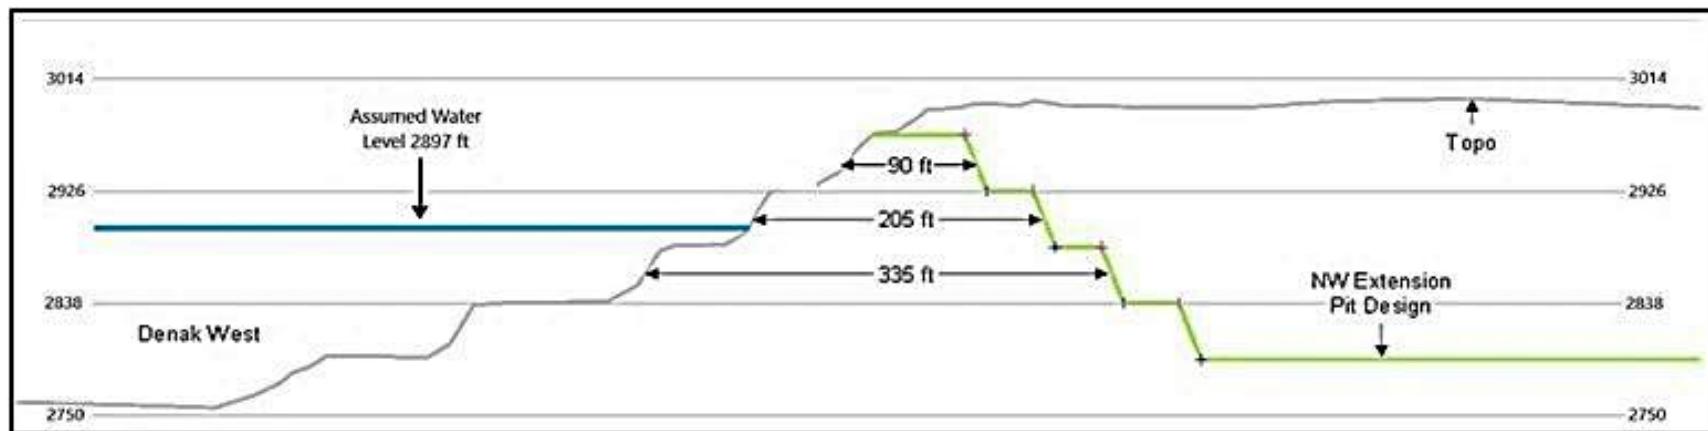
Rock Pillar Separating Denak West and Northwest Extension Open Pits
